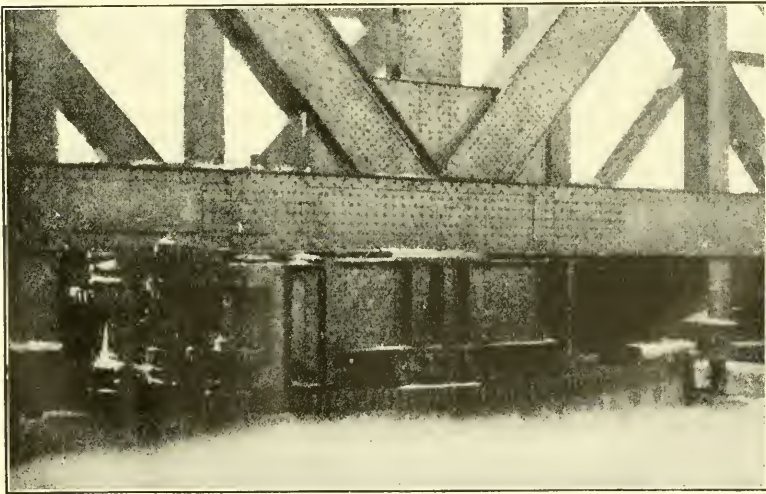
CONNEAUT DRAW SPAN. CENTER CARRYING GIRDERS, AND RACK AND PINIONS.
